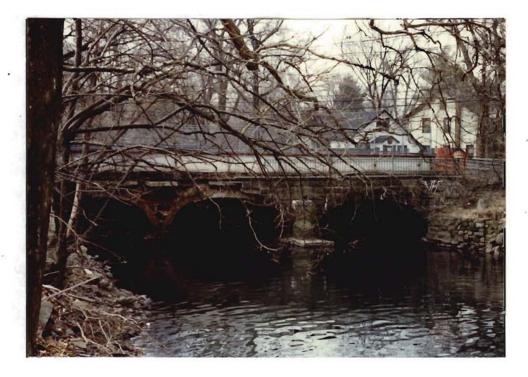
Photograph of collapsed bridge facia of Lincoln Avenue/High Street
